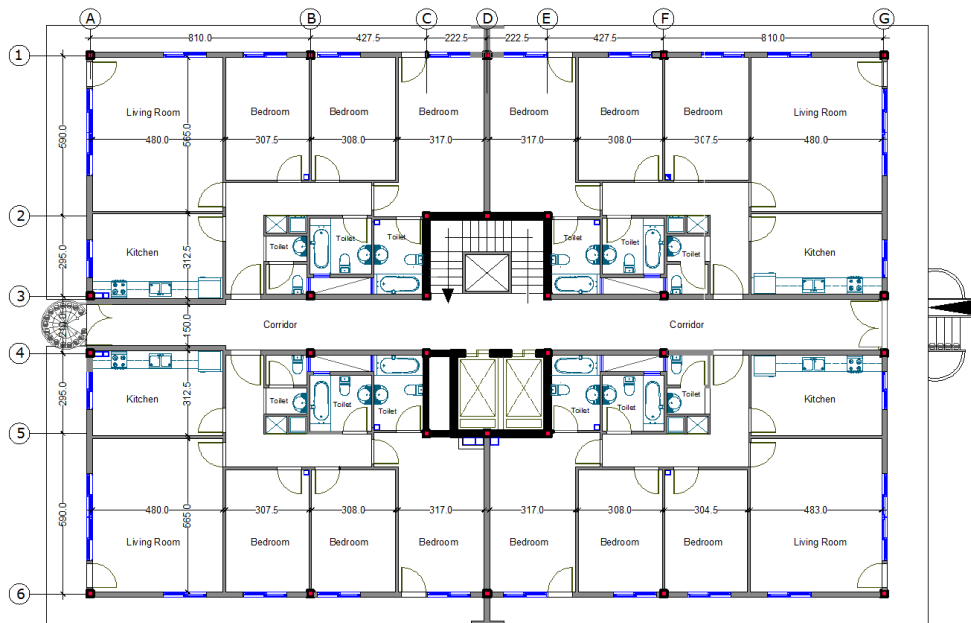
Ground floor plan view showing the distribution of steel columns and central shear walls
